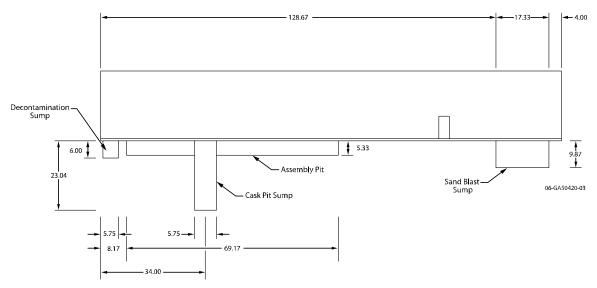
TAN-607A elevation view showing sumps and pits (looking north).
